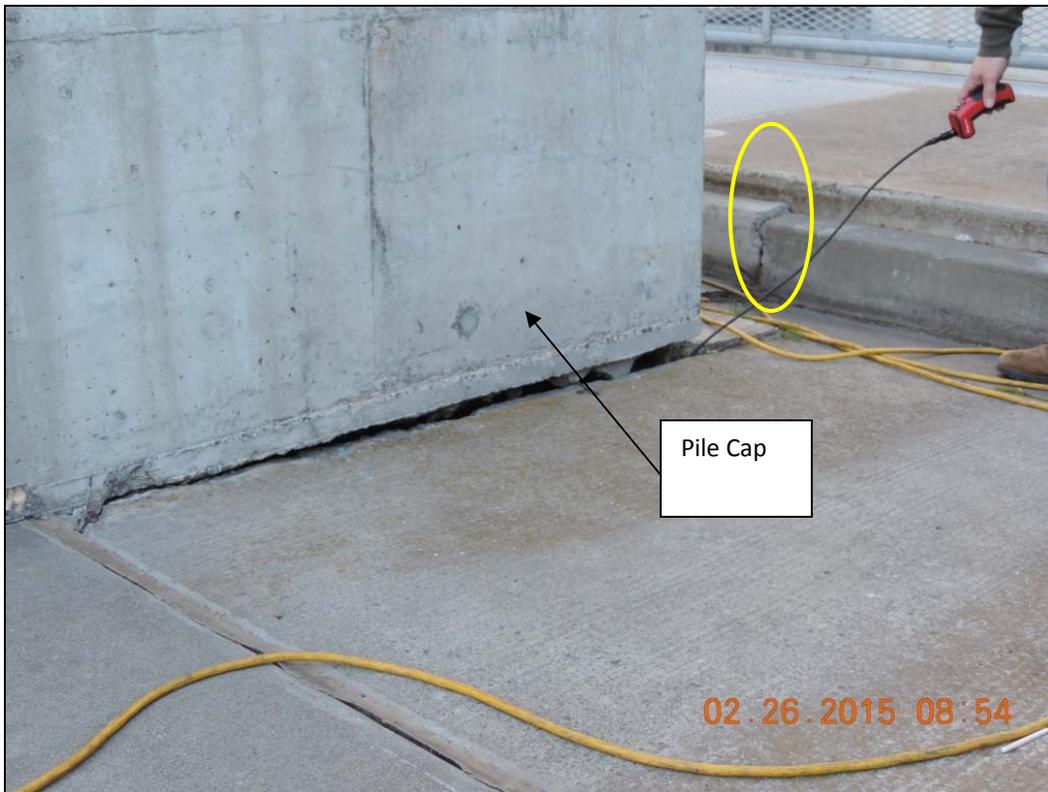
South Fish Ladder Section 10 subsidence with Project camera probe
